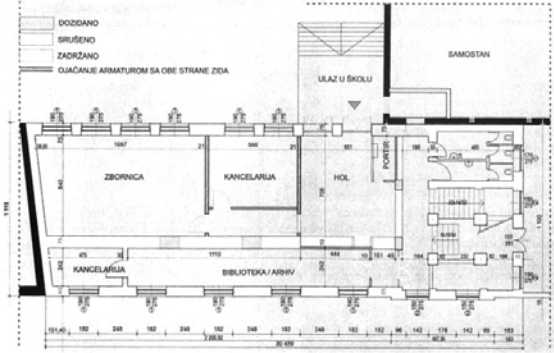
Monastery of Sisters of Mercy of Saint Vincent De Paul, Gymnasium building; floor plan of reconstructed building.
